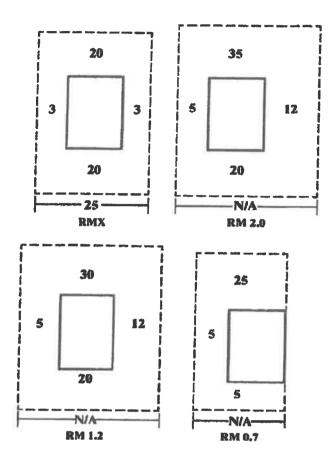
Minimum Setbacks for Multi-Family Buildings 35 ft. in Height
